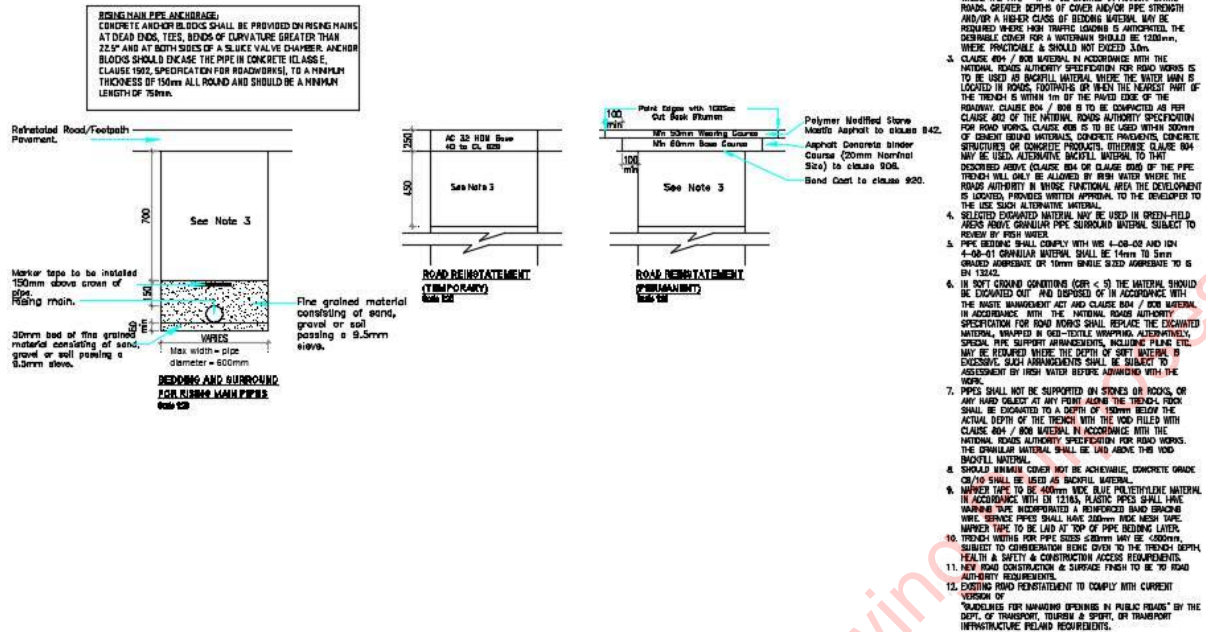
Details of Rising Main Pipe Anchorage and Reinstatement.
